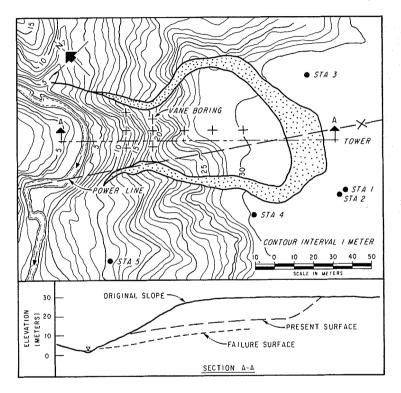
PLAN OF BRECKENRIDGE SLIDE AREA
